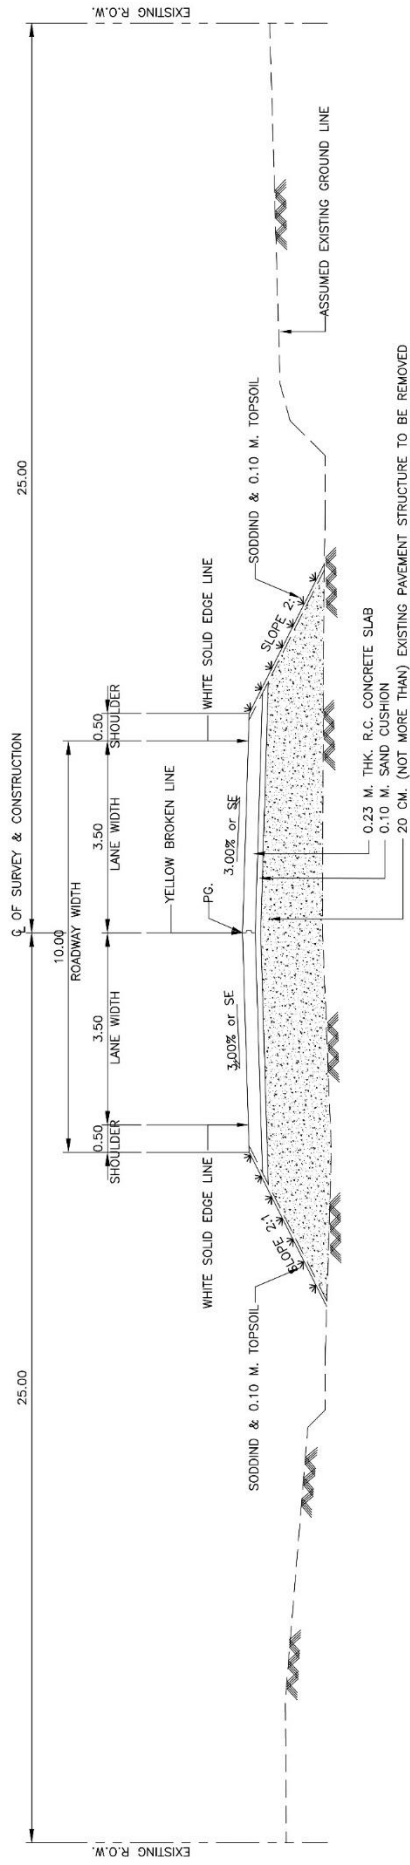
Typical Section of Sta. 28+800 - Sta. 29+100
